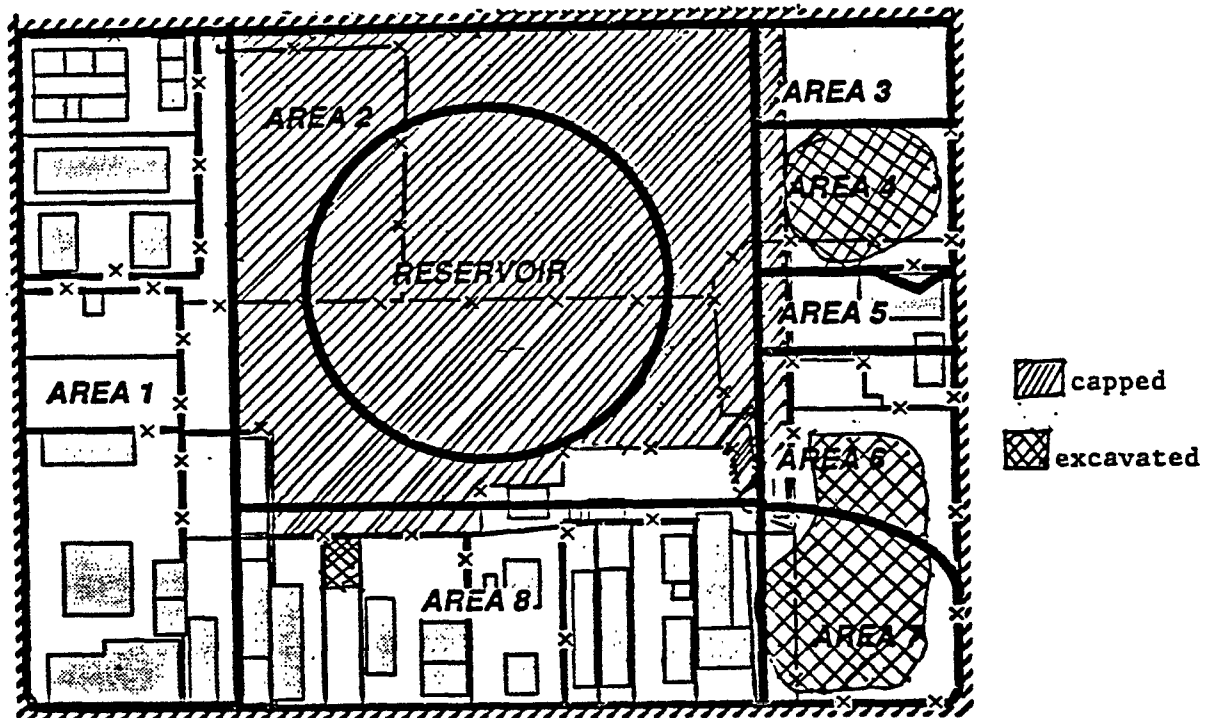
Areas to be Excavated and Capped for Alternatives 3C and 3D
